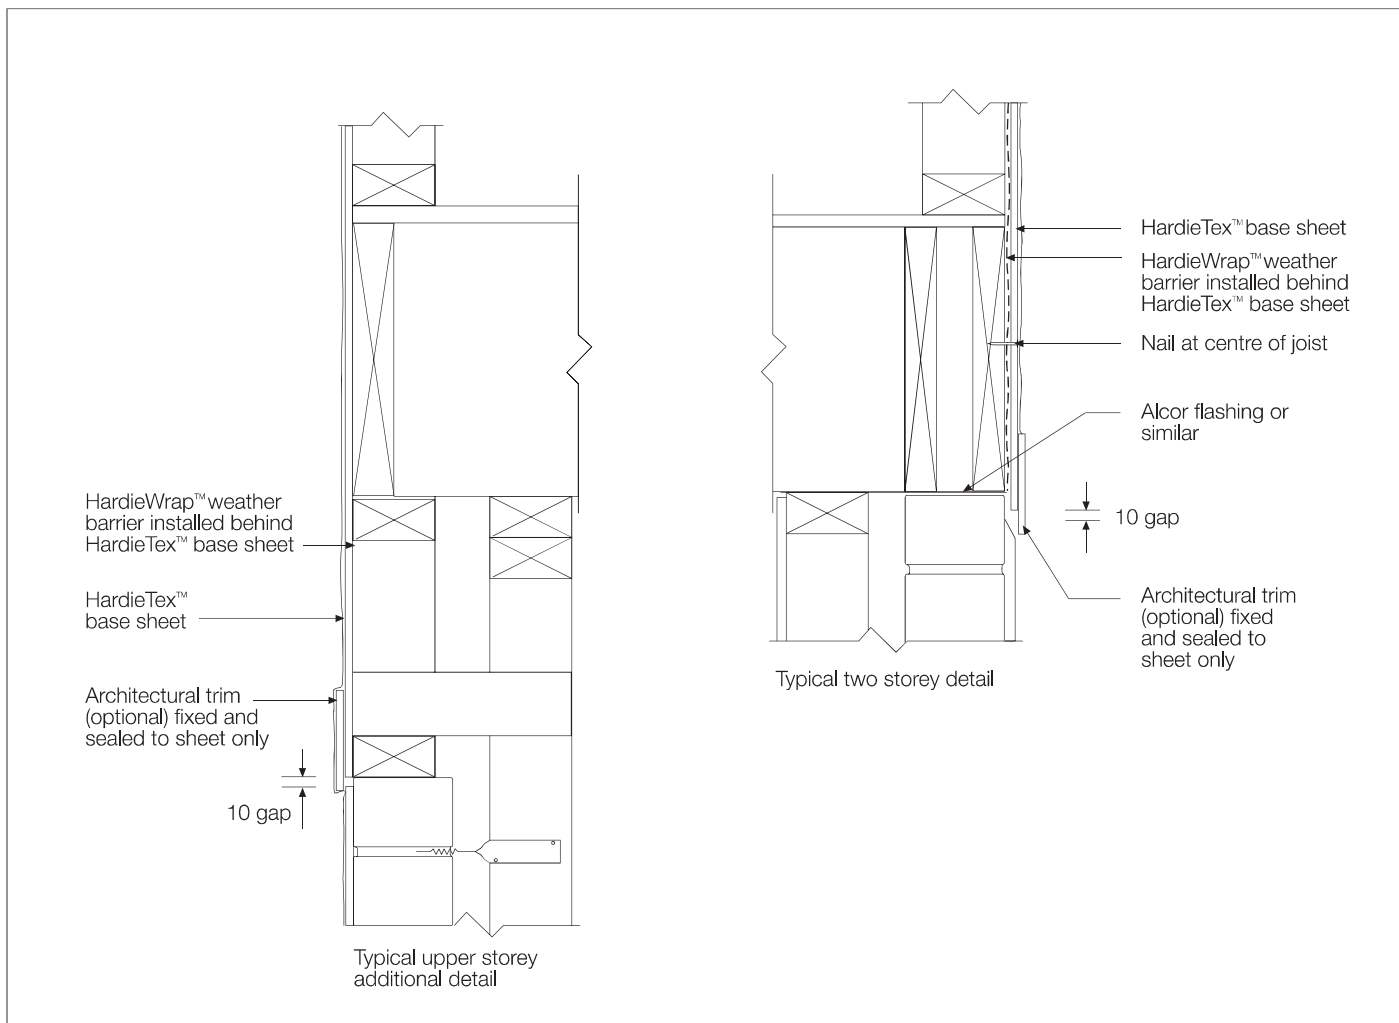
HORIZONTAL MOVEMENT JOINT - FLOOR JUNCTION WITH MASONRY GROUND FLOOR
